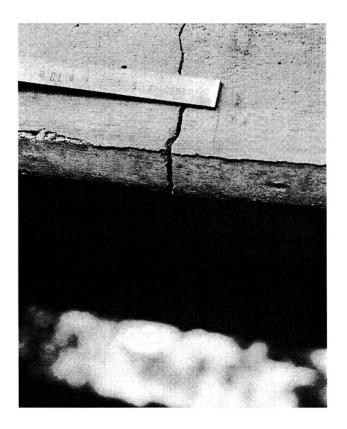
A Photo showing typical large cracks in RC beam of a bridge on TanZam highway.
